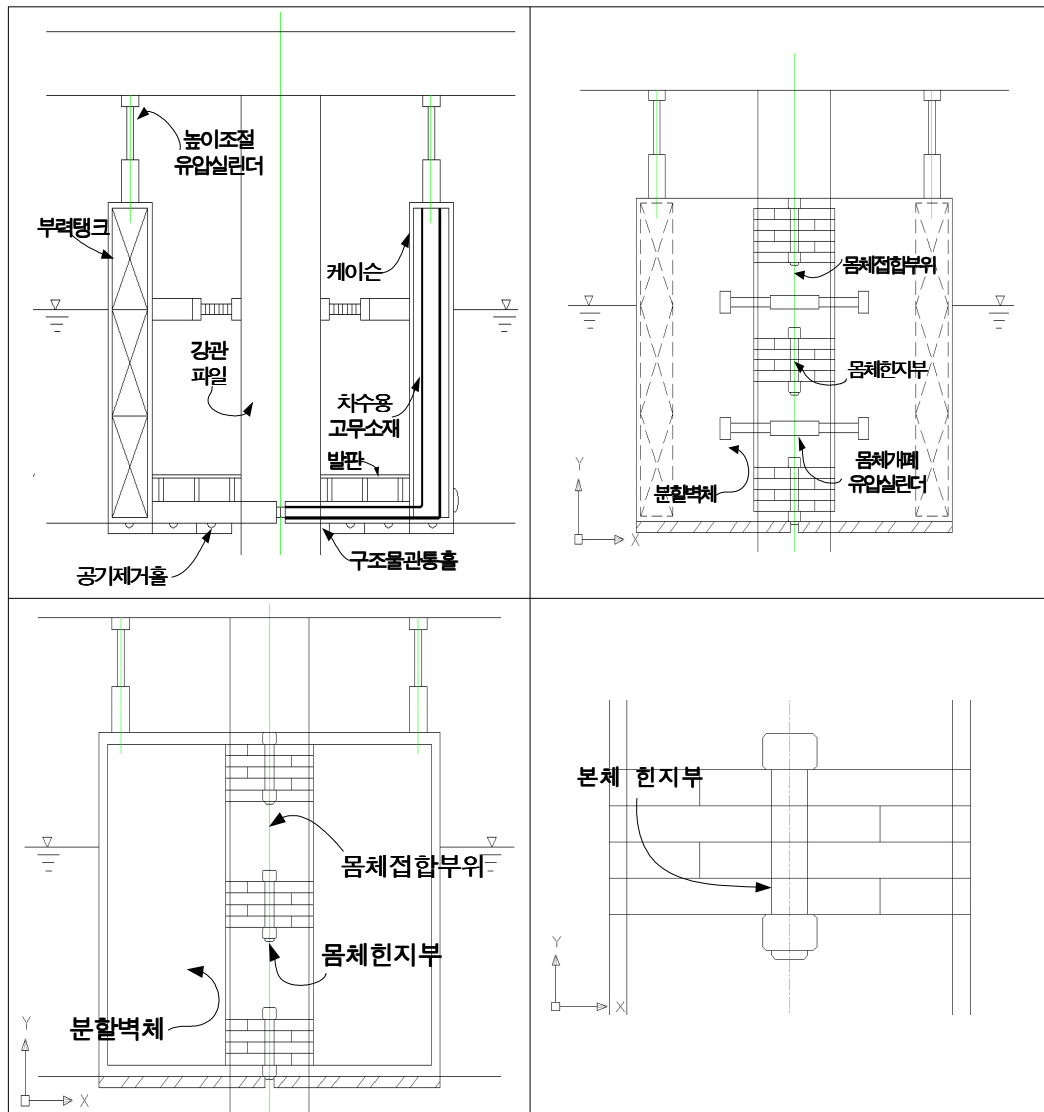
Sectional Drawing and Parts Detailed Drawing
